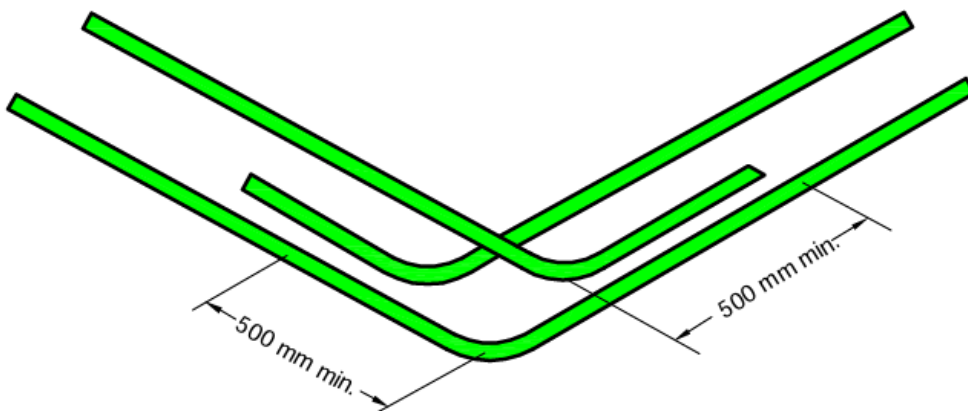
LAYOUT AND DETAILING OF TIE-COLUMNS AND TIE-BEAMS
